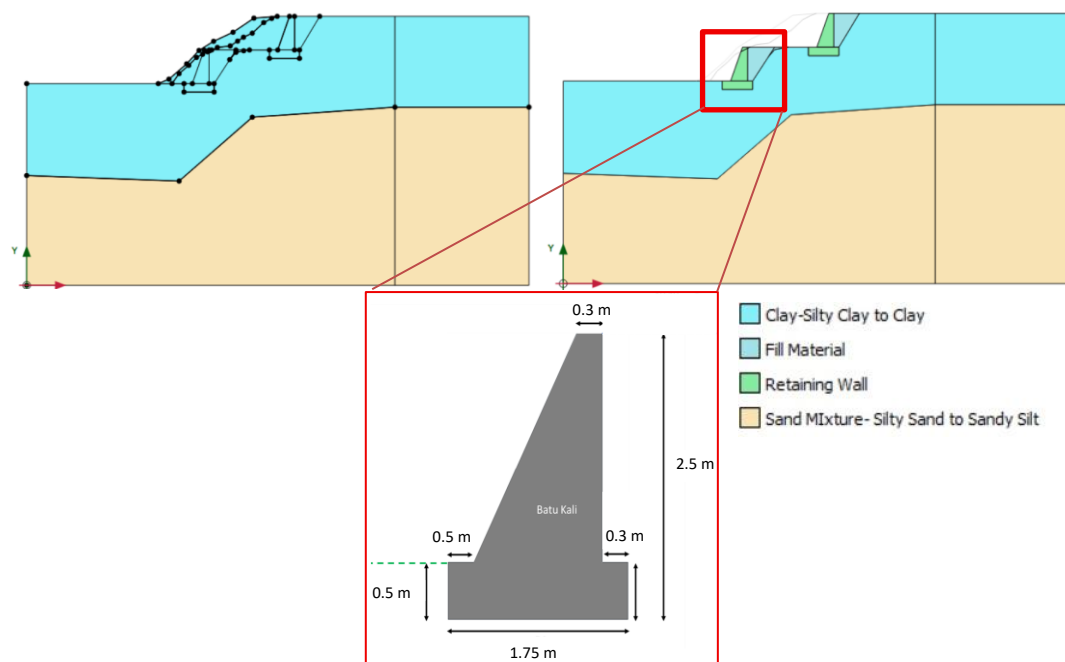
Geometry model of a) existing condition, b) end of construction, c) geometry of retaining wall
